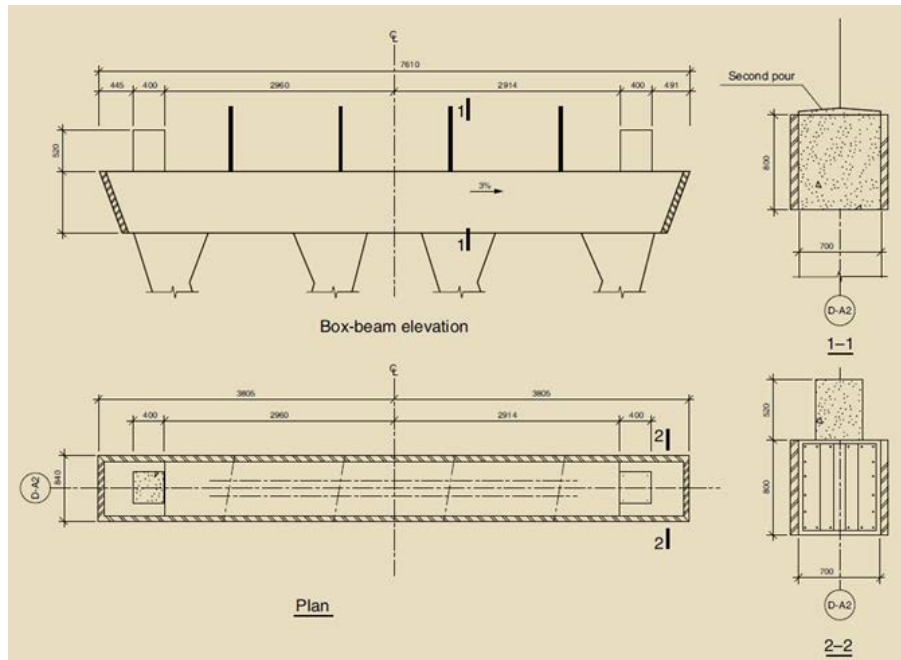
Pretensioned Precast Concrete U-Beam (Park 1995).
